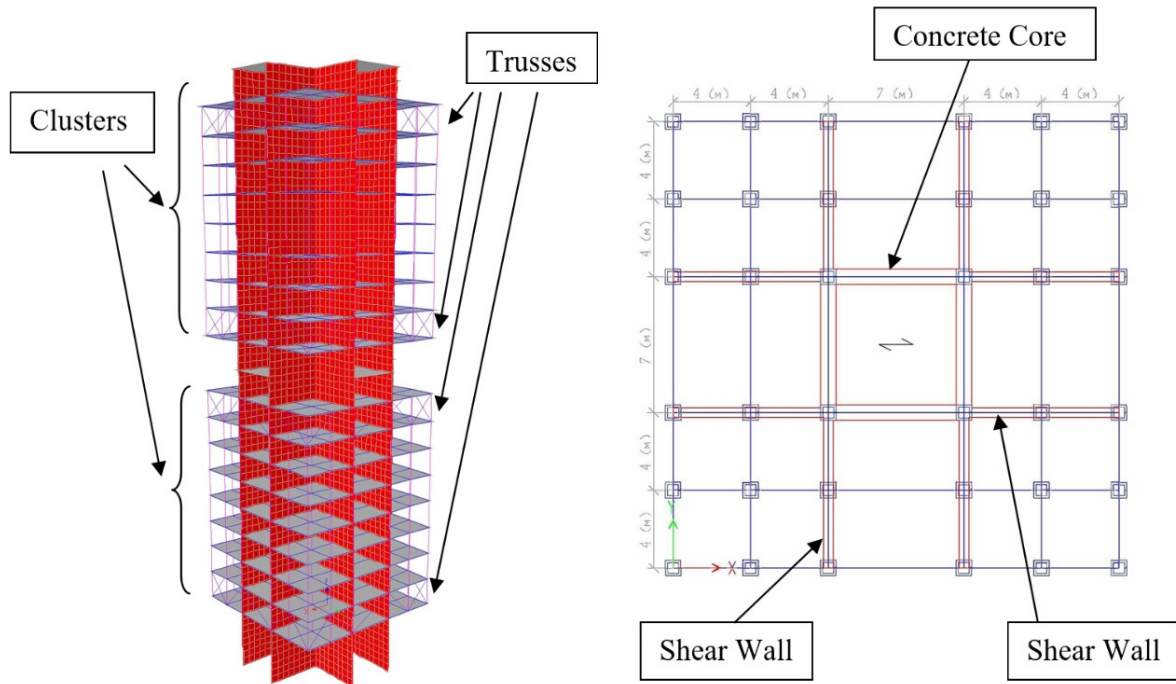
Three-dimensional view and plan of the suspended high-rise steel building with shear walls, but without end shear walls (SS2).
